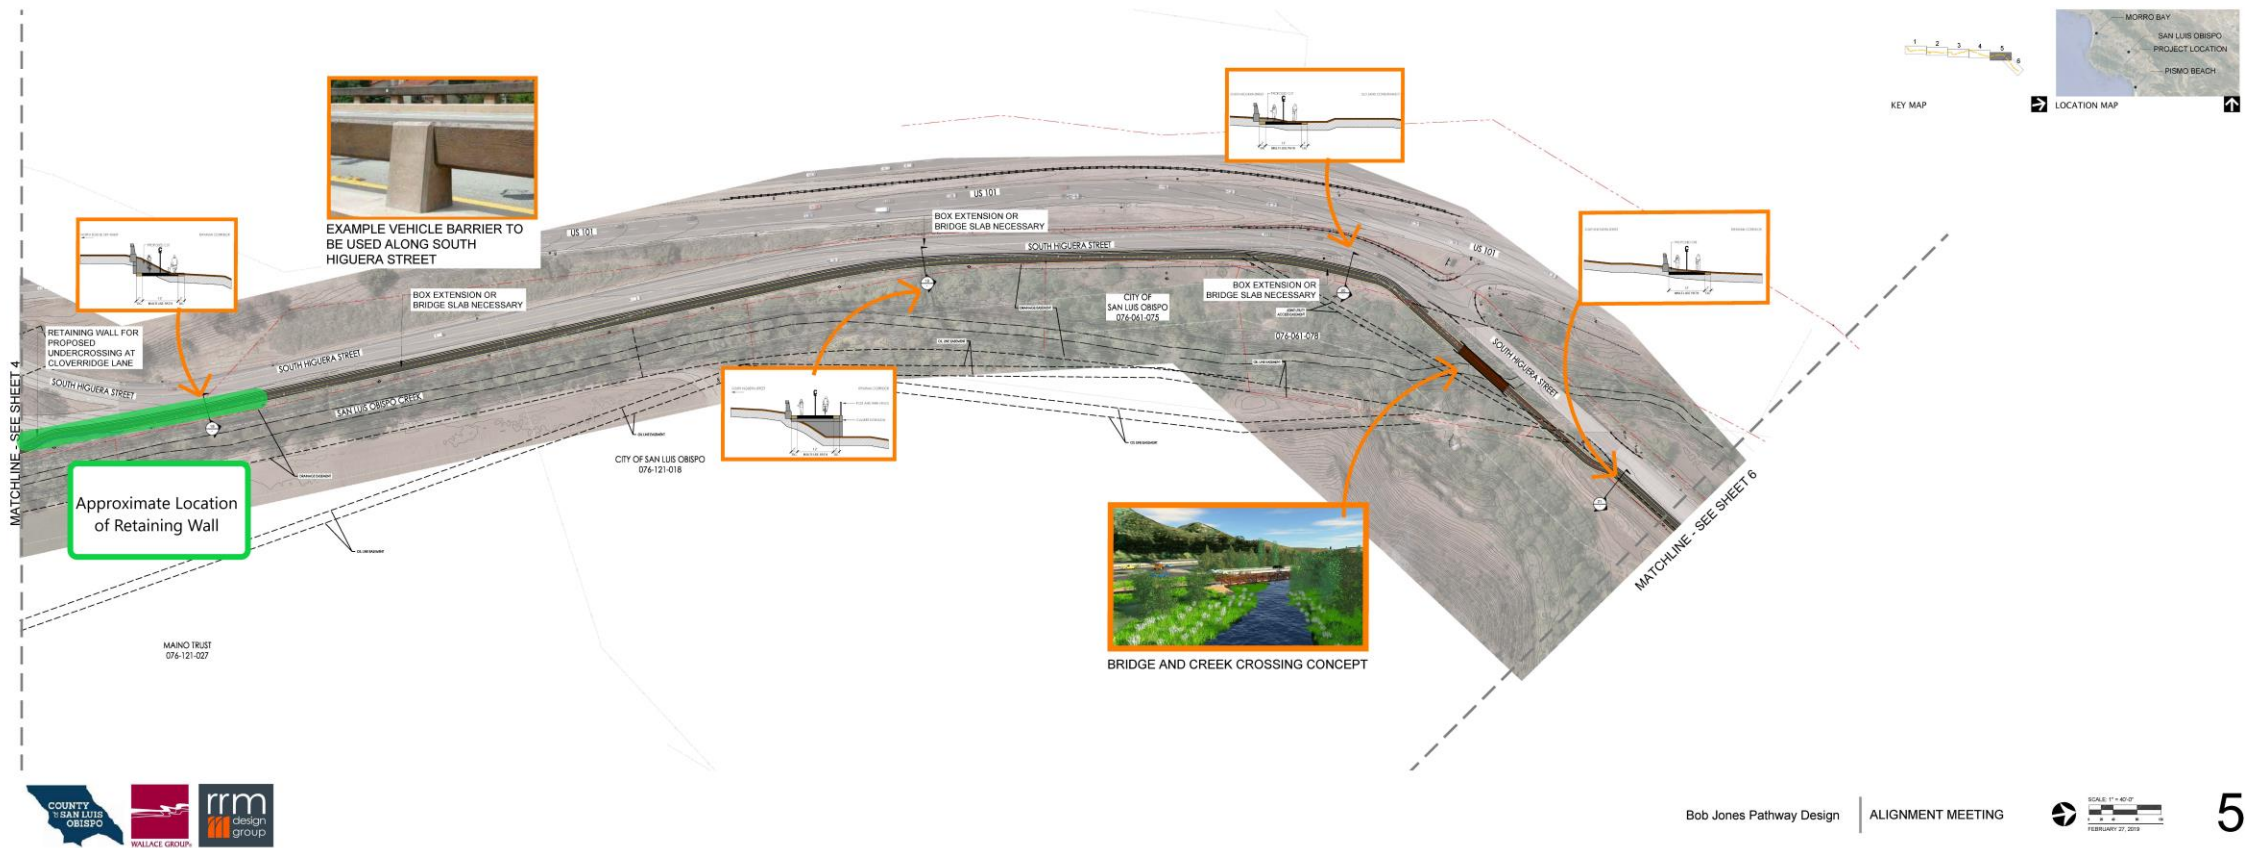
Proposed Revisions from Conceptual Design Plans Sheet 5
